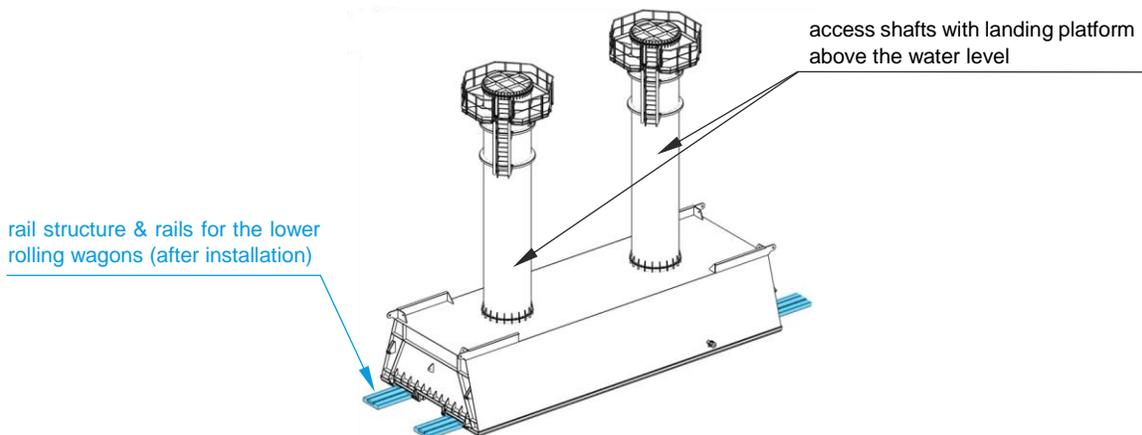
Habitat structure that will be used to install the rail system on the lock floor.
